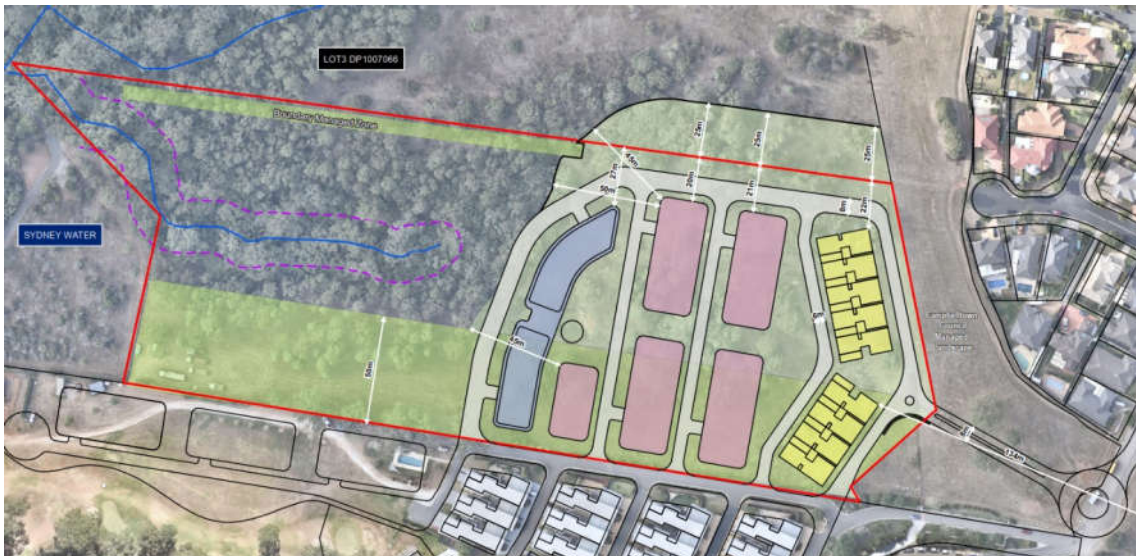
Master plan showing the commercial buildings in blue and the residential buildings in pink and yellow
